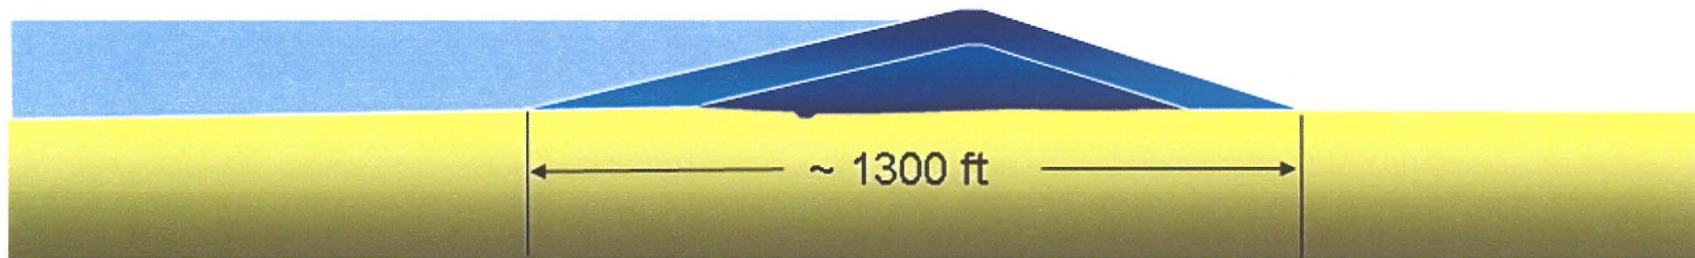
Dam Cross Section – Reservoir at Elev. 1588 ft.
